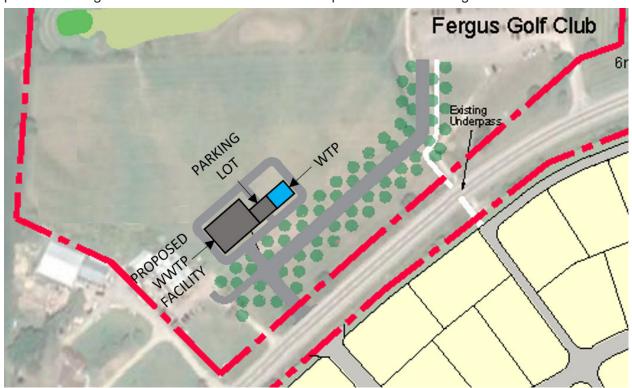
Preliminary Water Treatment Plant Site Footprint
